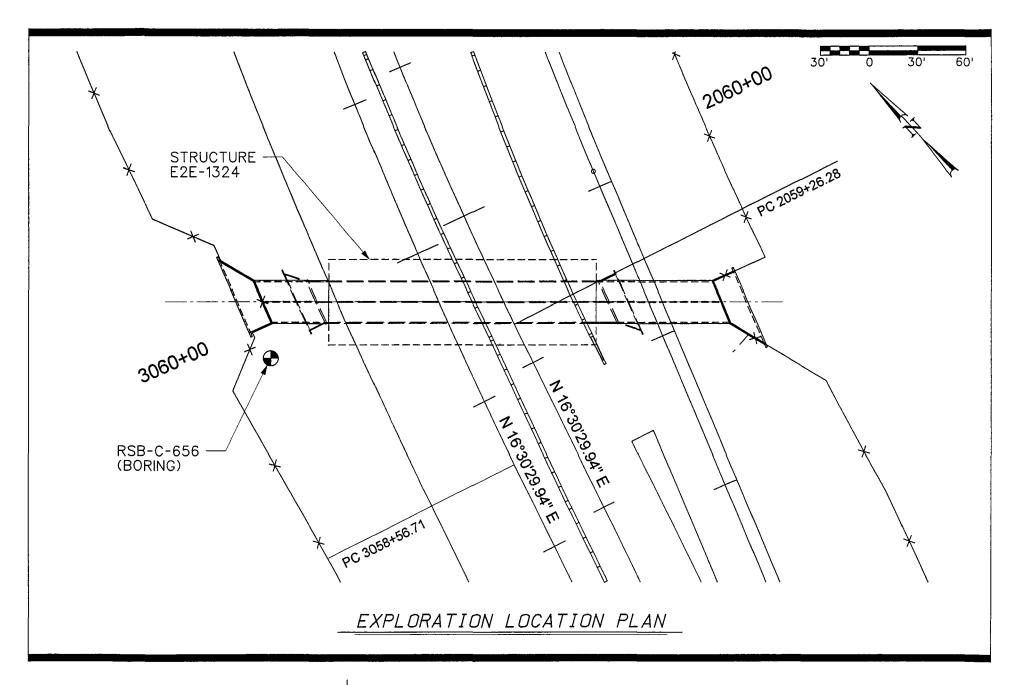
SITE PLAN & TEST HOLE LOCATIONS
